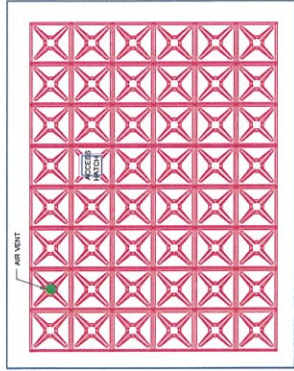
DETAILED ELEVATION VIEWS OF WATER STORAGE
